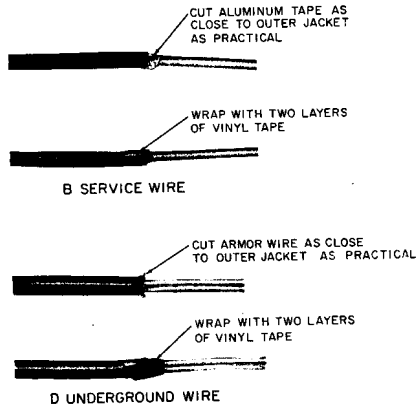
Removal of Aluminum Tape or Armor Wire
